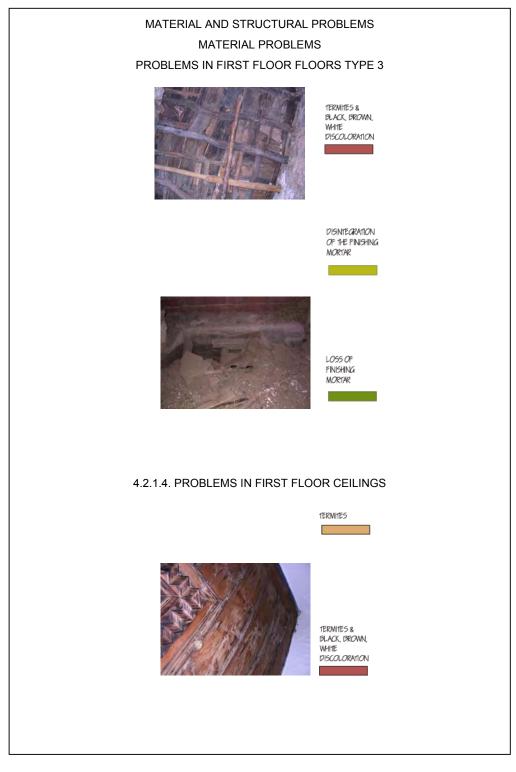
Material problems in first floor floors type 3 and first floor ceilings
